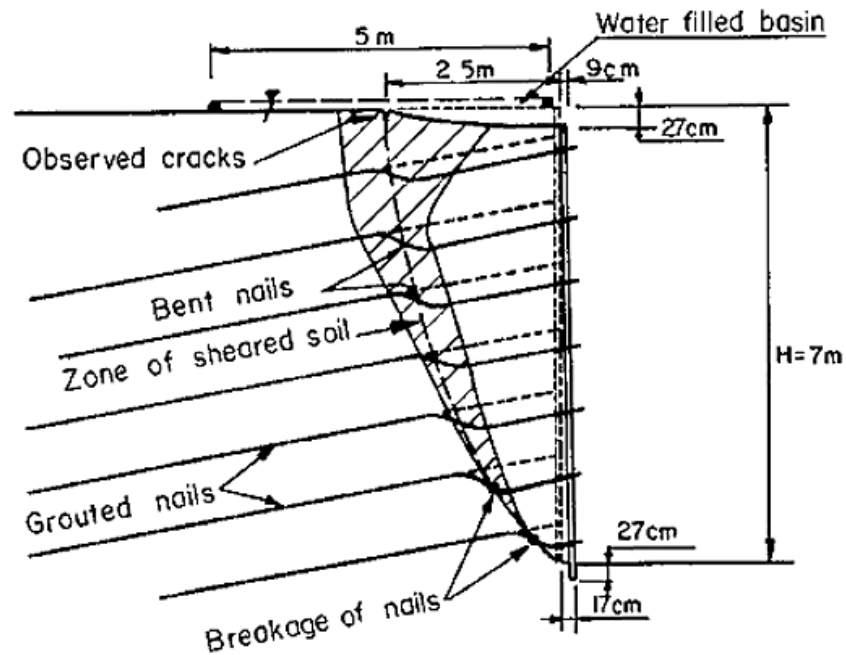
Post-failure observation of the first large-scale experimental soil nailed wall (Zhou 2008).
